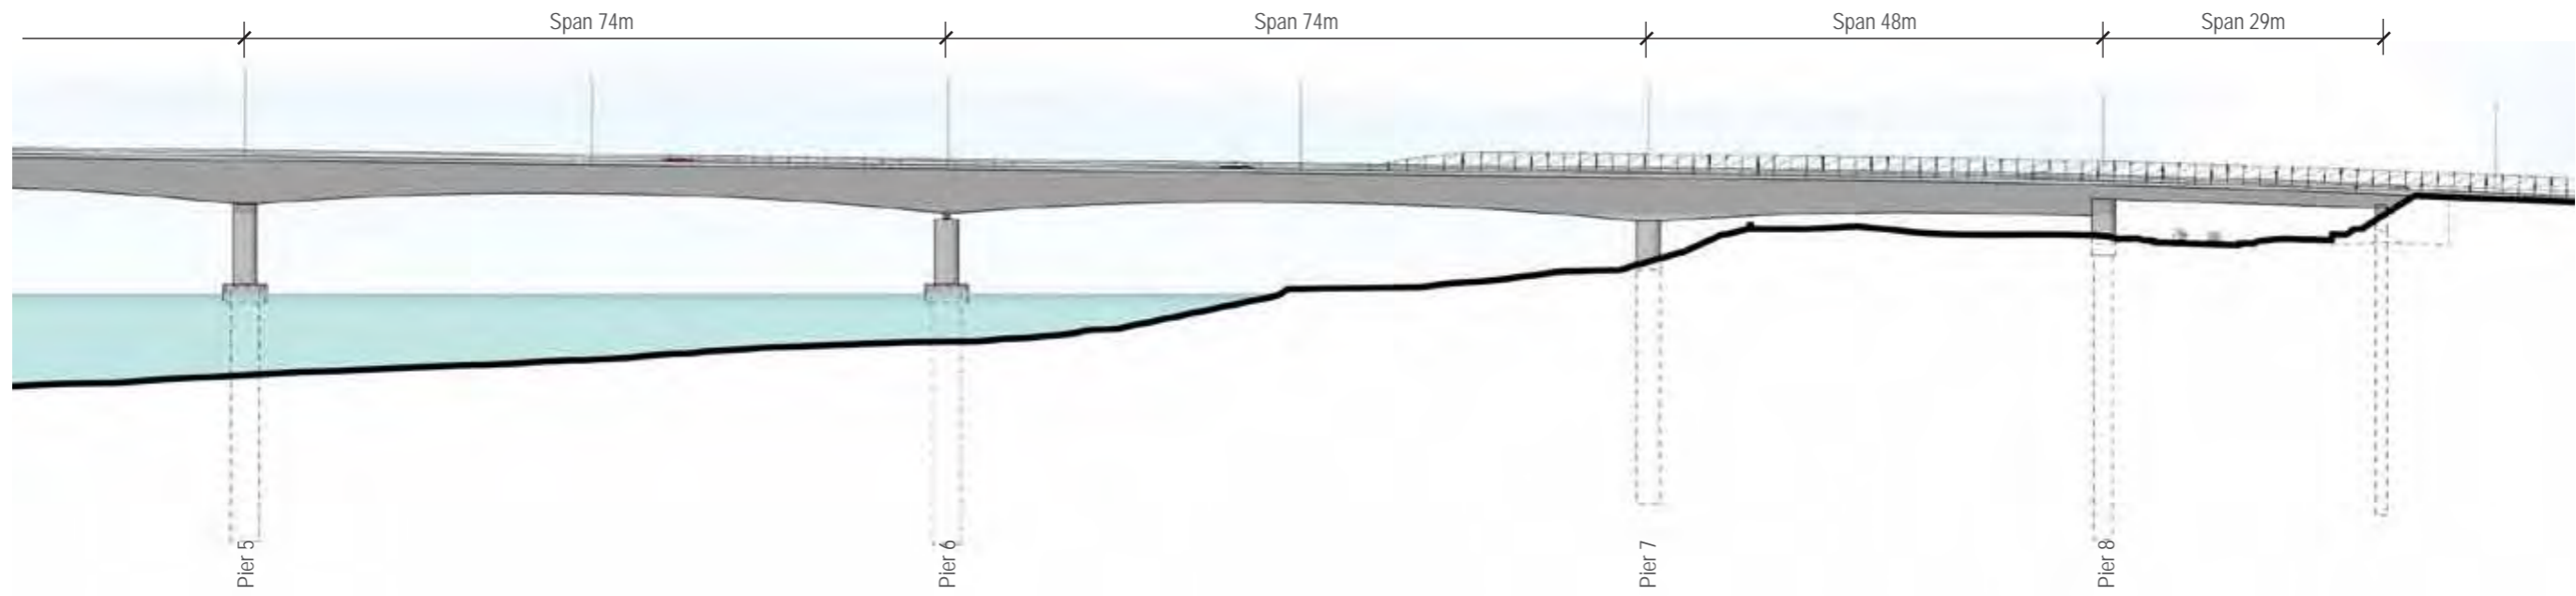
View of the additional bridge over Clarence River at Grafton looking south west
